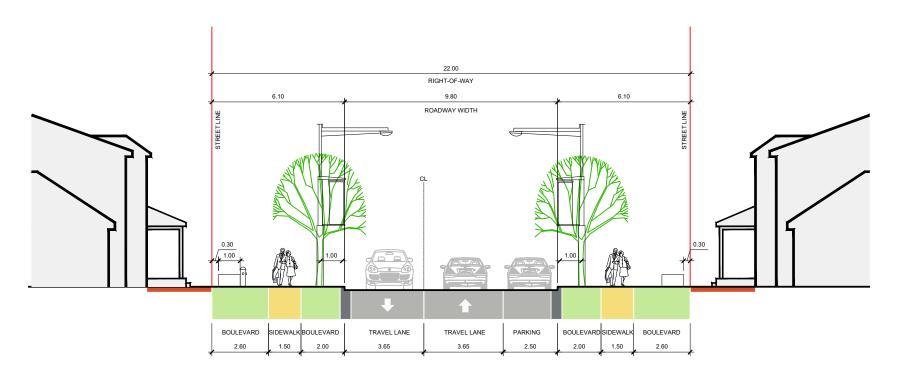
B-B' Proposed Minor Collector Road Cross Section
